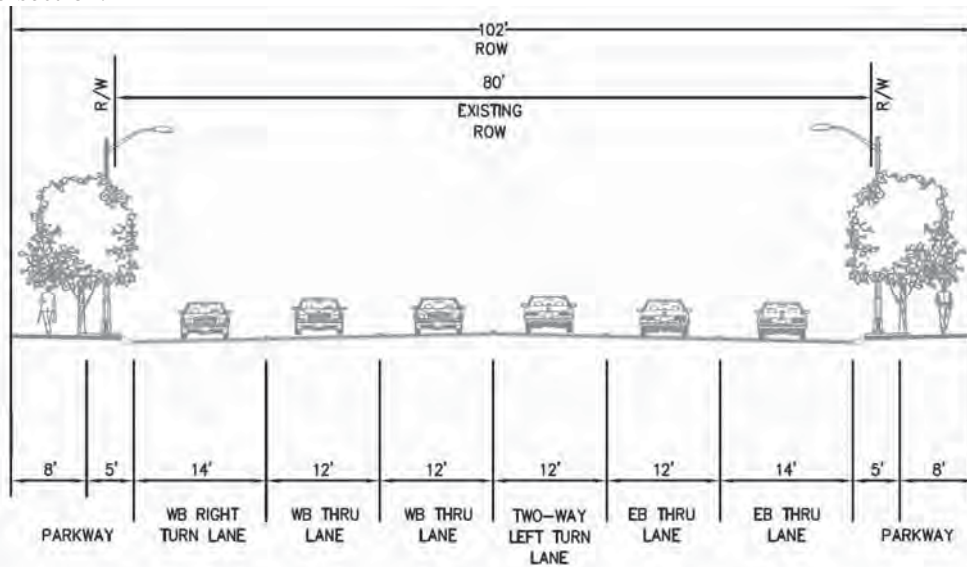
Proposed Cross Section, E Street Between I-5 and 300' East of I-5 N Ramp
